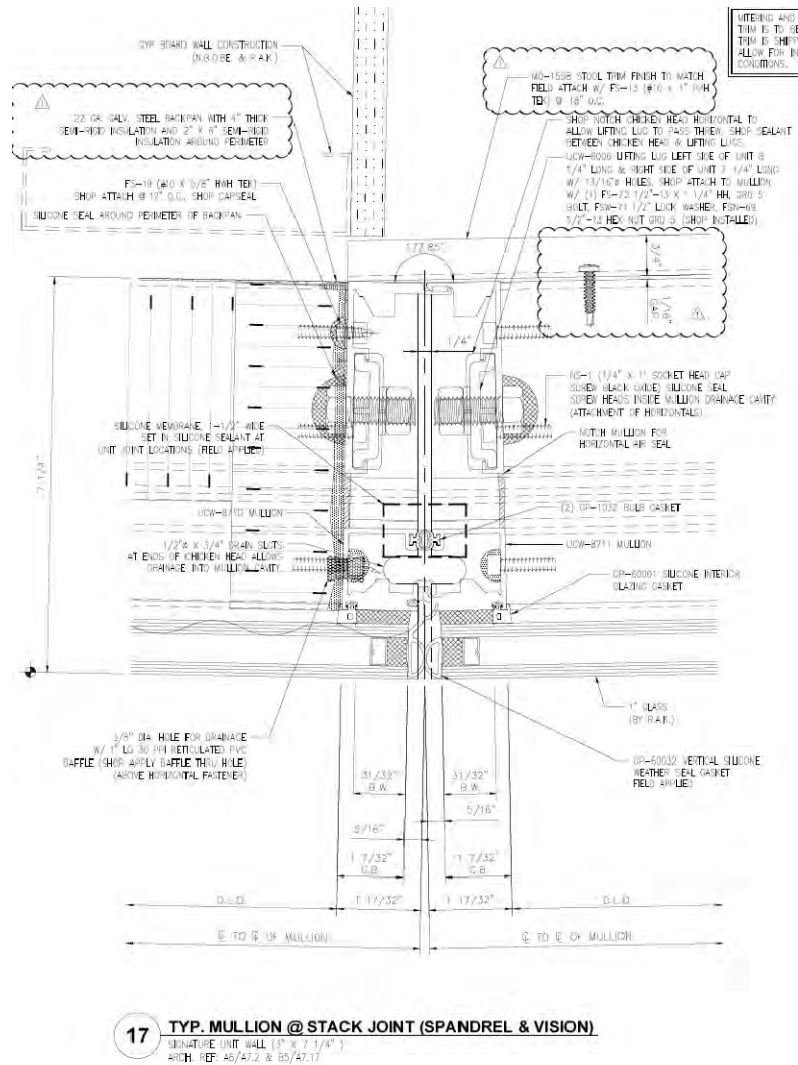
Detail #1. Horizontal section below the analyzed detail. Drawing 3-114.
